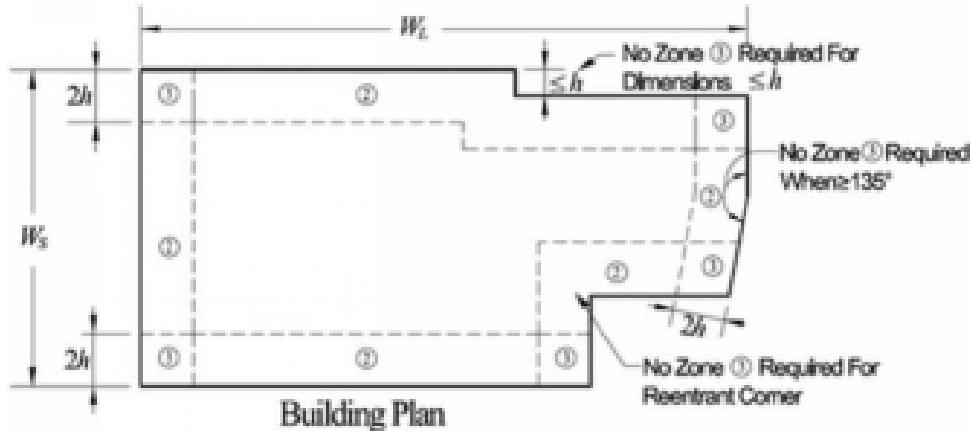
ASCE 7-16 Figure C29.4-1 shows a sketch of Building with Irregular Plan Dimensions
